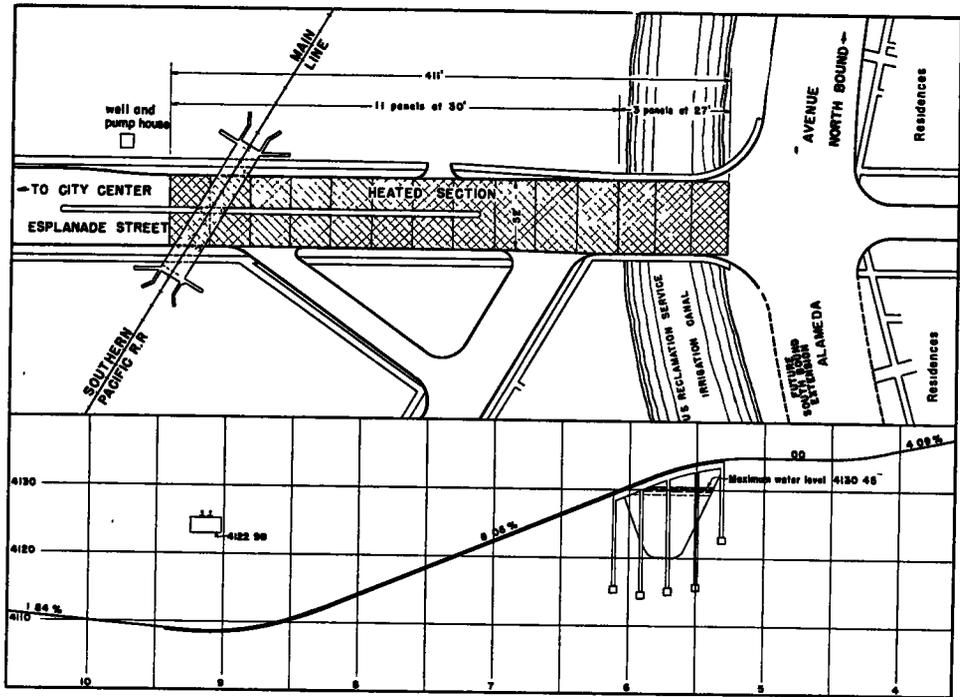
Plan and Profile, Klamath Falls Heating Installation
